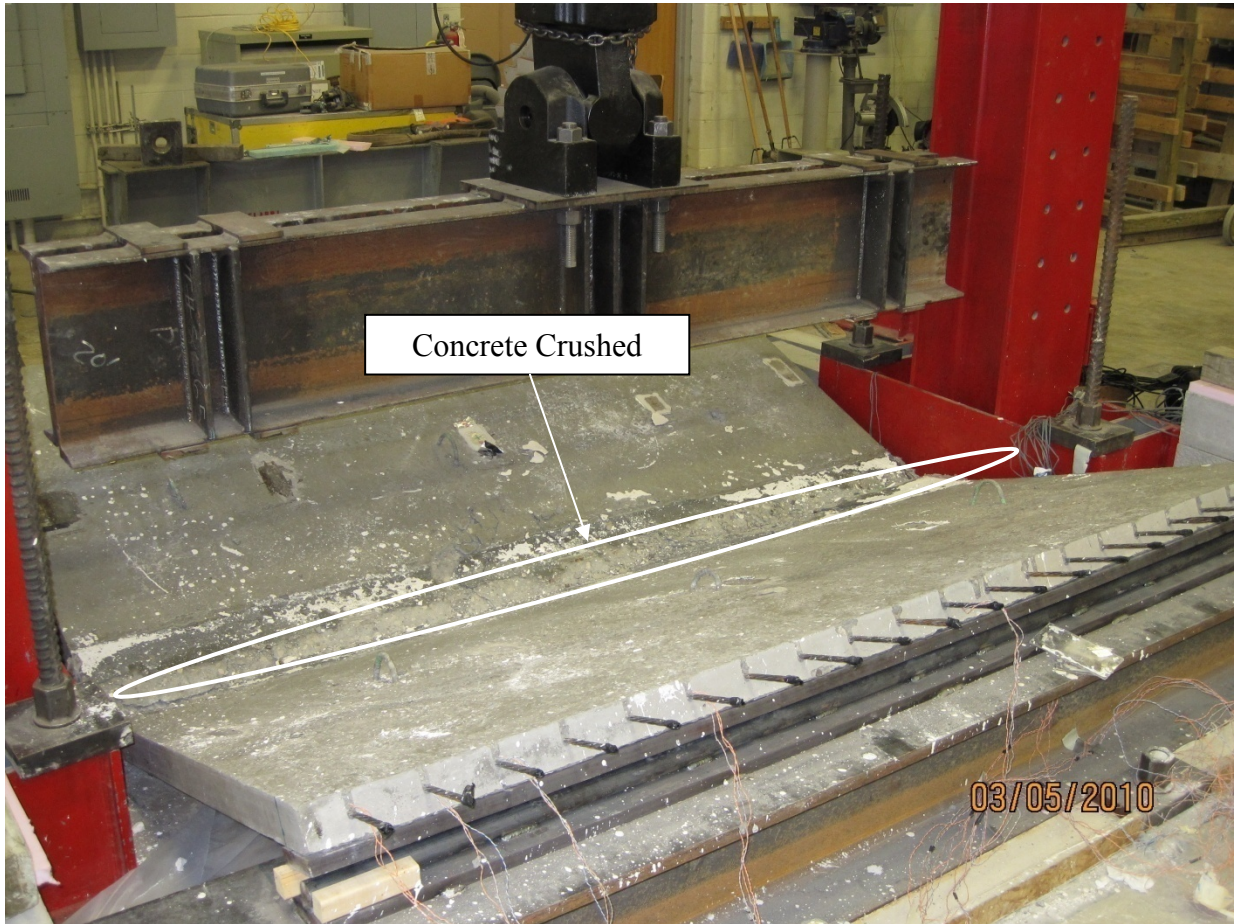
Flexural Failure at Midspan by Concrete Crushing of Panel ST-NC-SL
